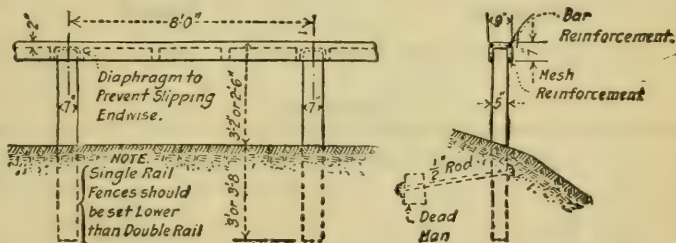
Typical reinforced concrete rail with post anchor blocks. This type gives some real protection as well as acting as a warning.
